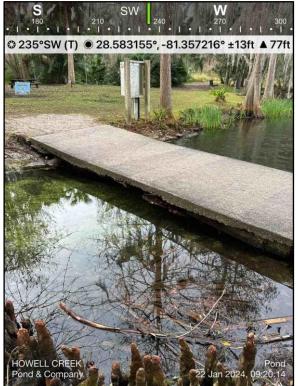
Structure 4; Sheet Pile Wooden Capped Retaining Wall (Priority 3)
